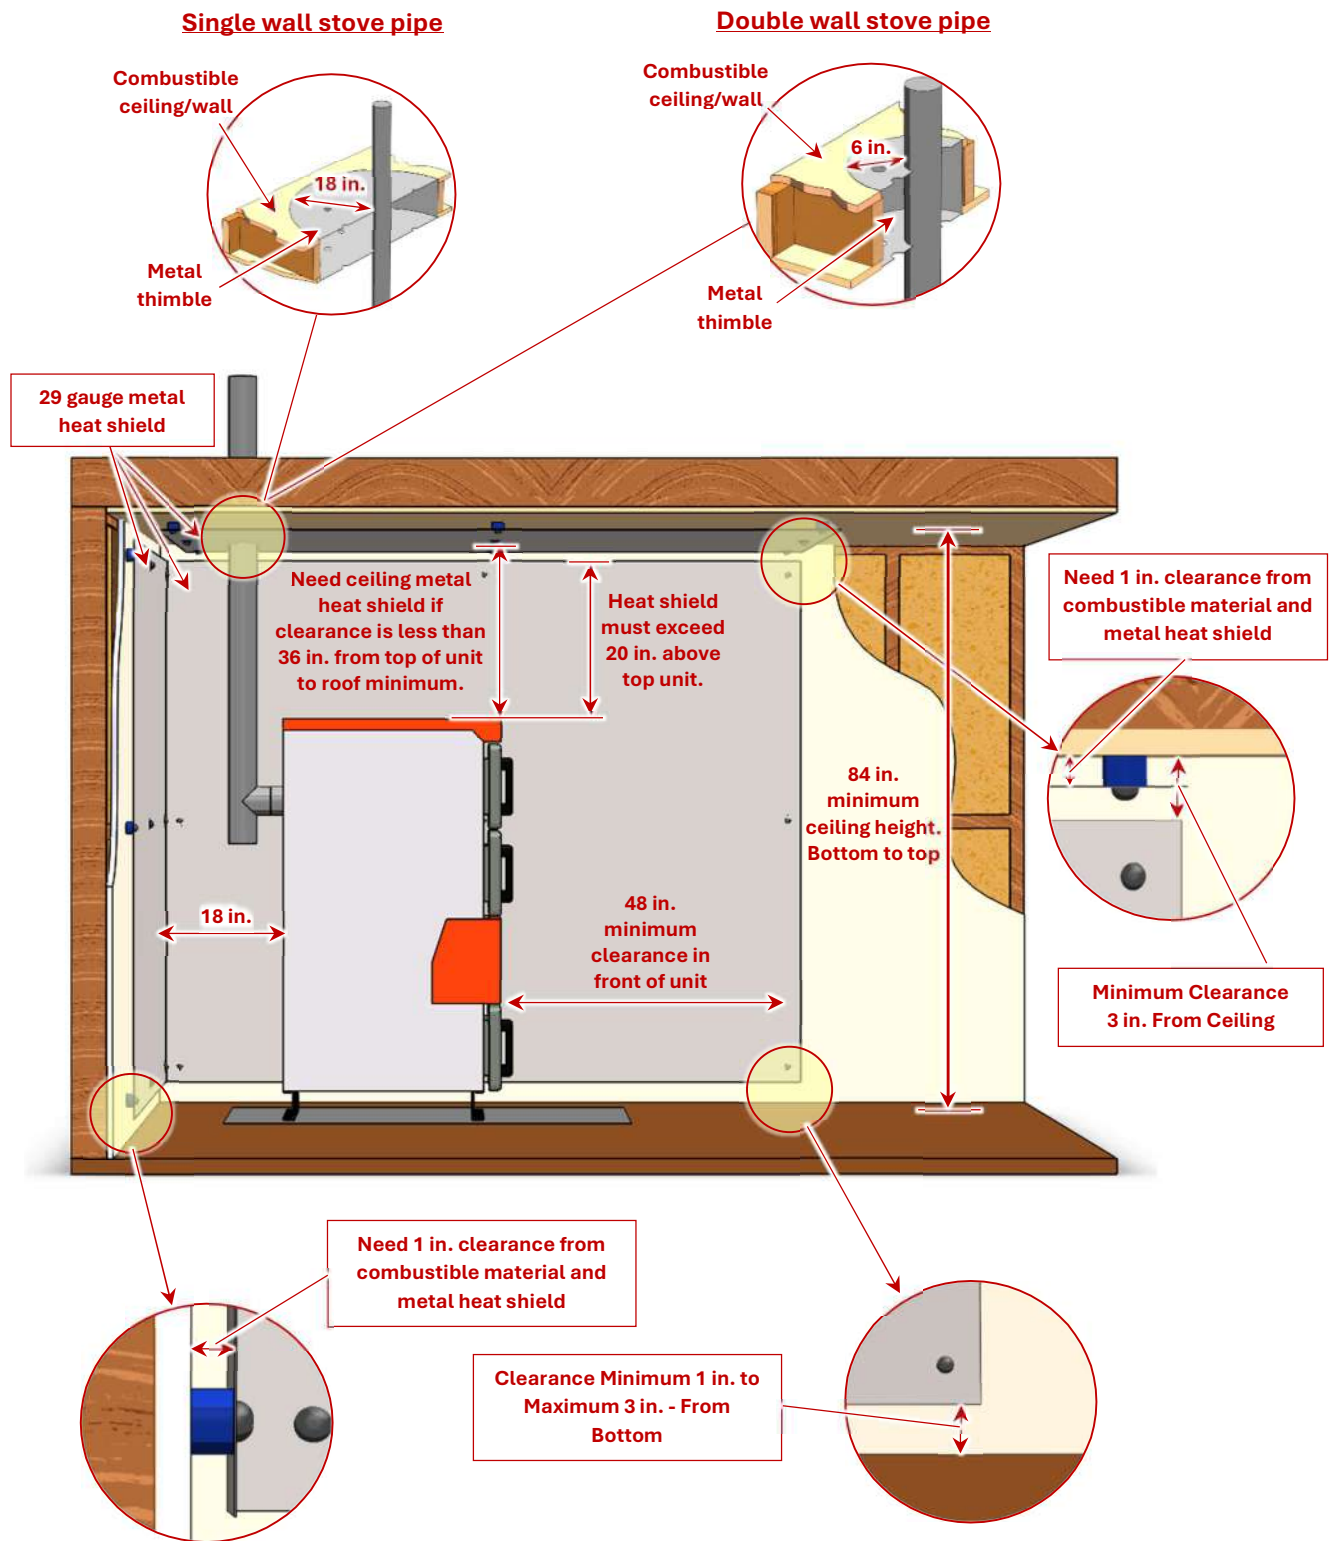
Minimum clearances for uncertified units (with heat shield)
